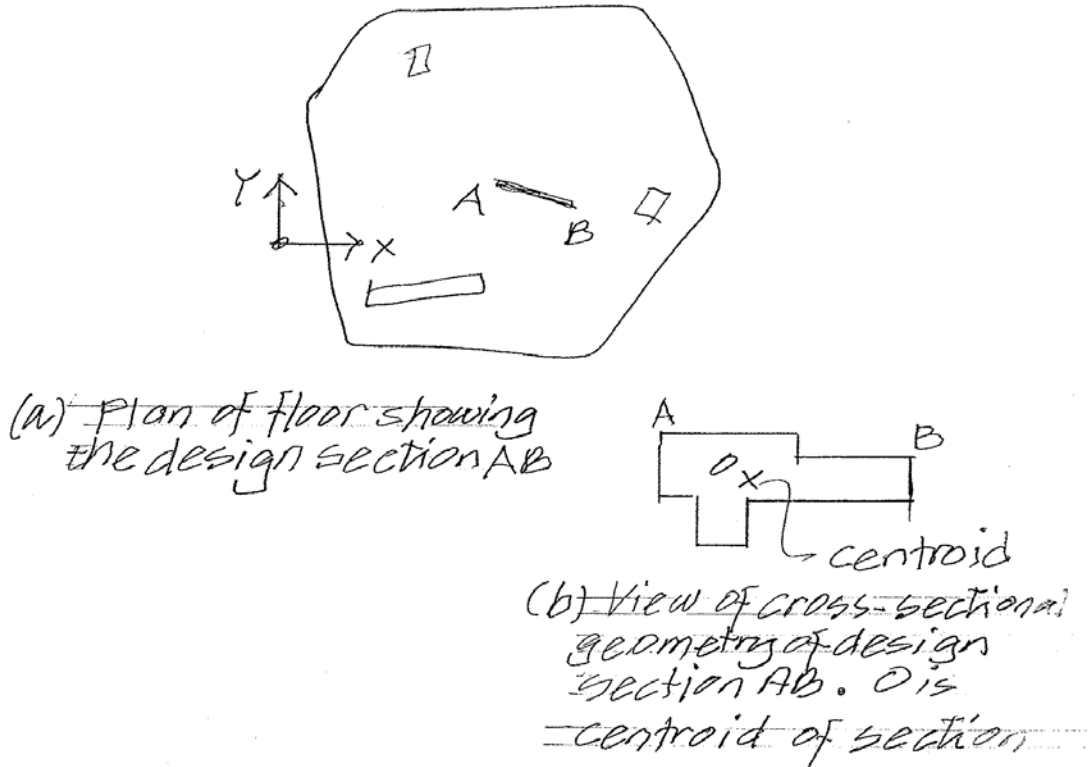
DESIGN SECTION AB AND ITS CROSS-SECTIONAL GEOMETRY
